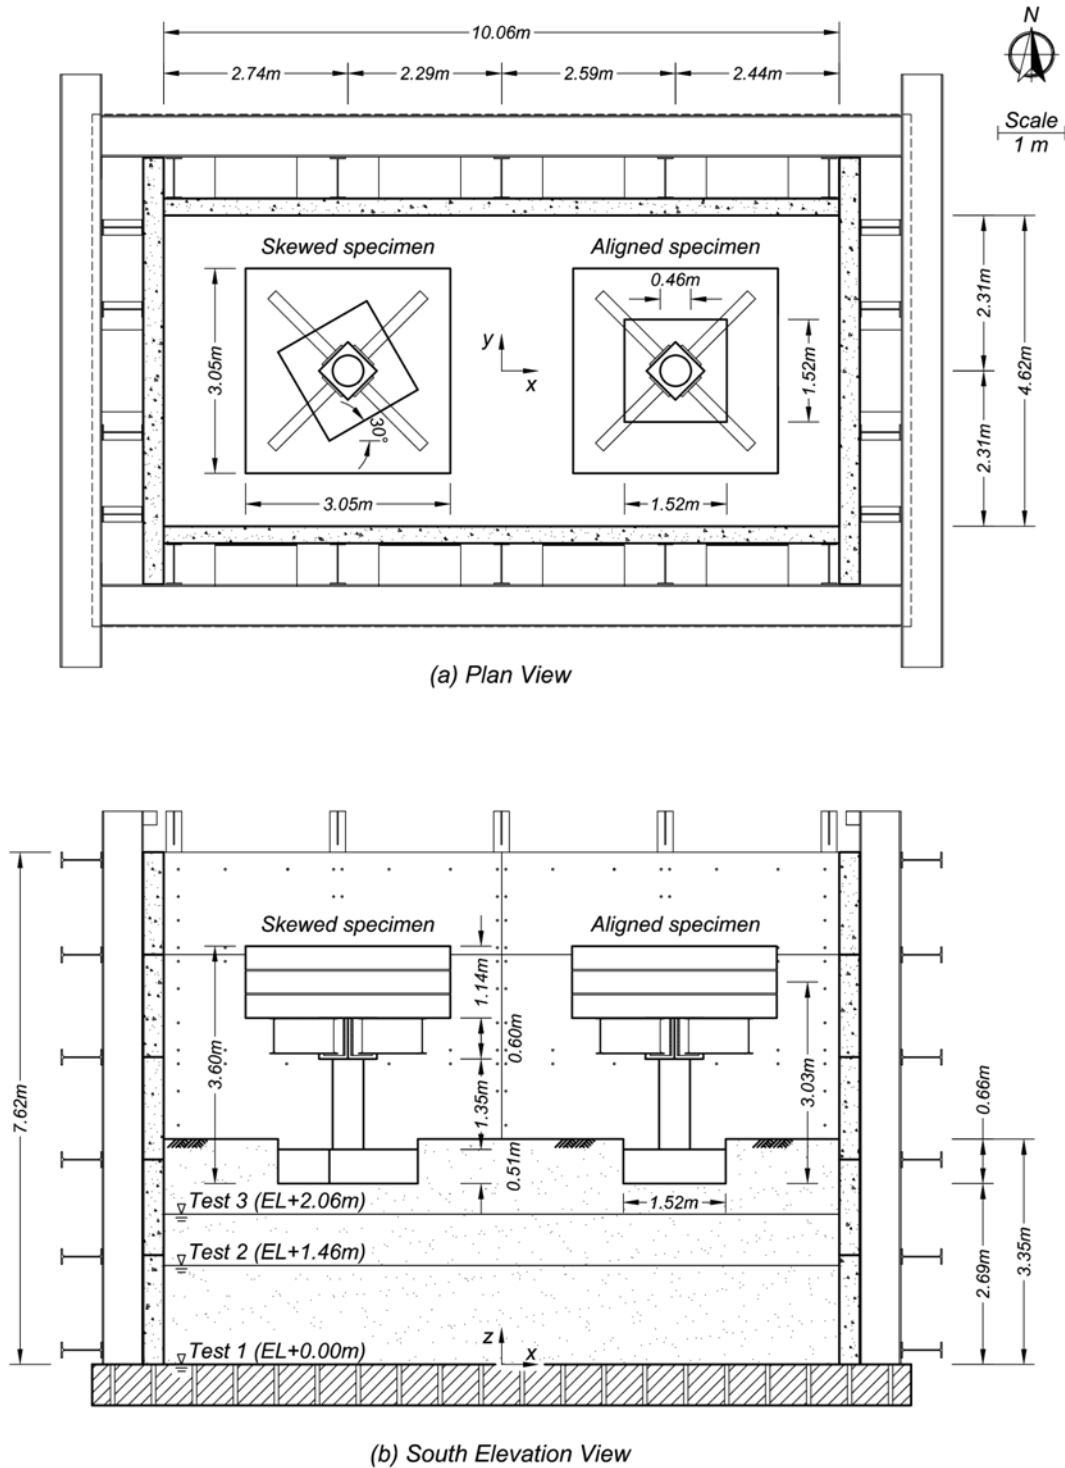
(a) Plan and (b) south elevation view of the test setup and basic geometric characteristics of the LSCB, the soil, and the bridge column specimens. The direction of shaking is along the East-West direction.
